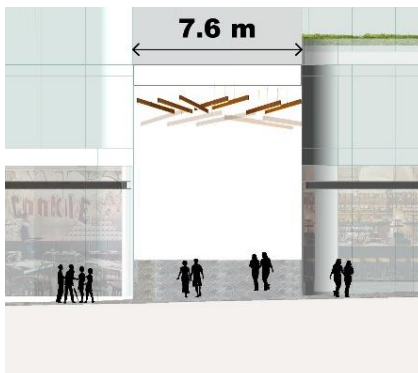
Victor Street elevation looking west (south to north) (source: Mirvac Design)
